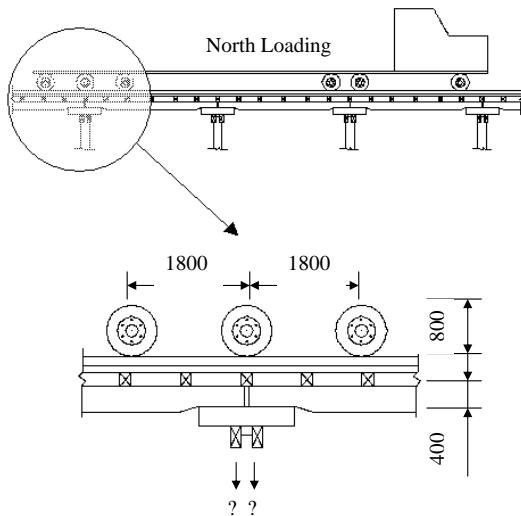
Half-cap load sharing for pier loads under north loading (typical elevation).
